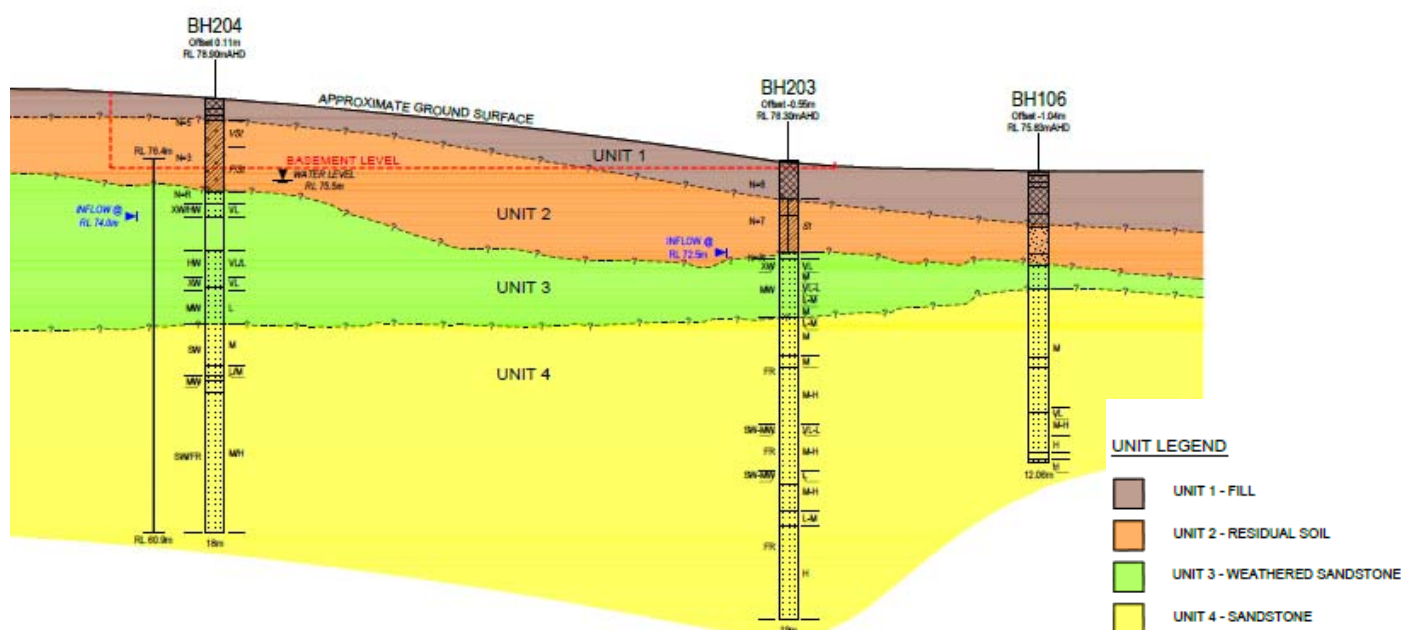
cross section (west-east) illustrating extent of excavation required on site
